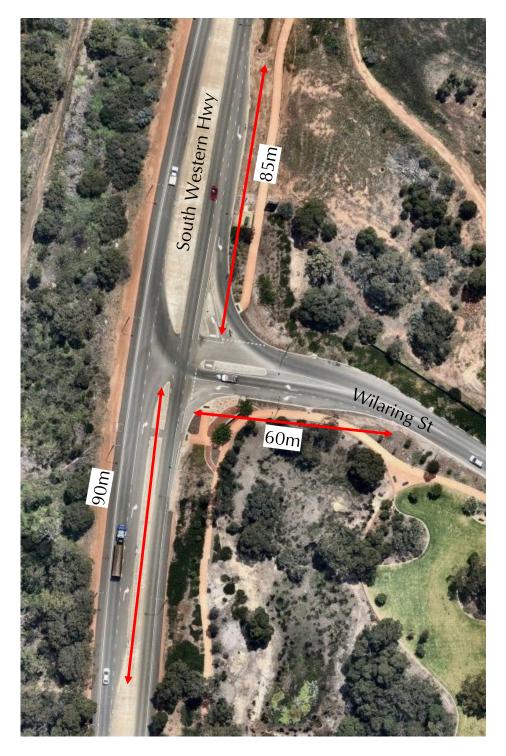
Existing standard of the intersection of SWH/ Wilaring St
